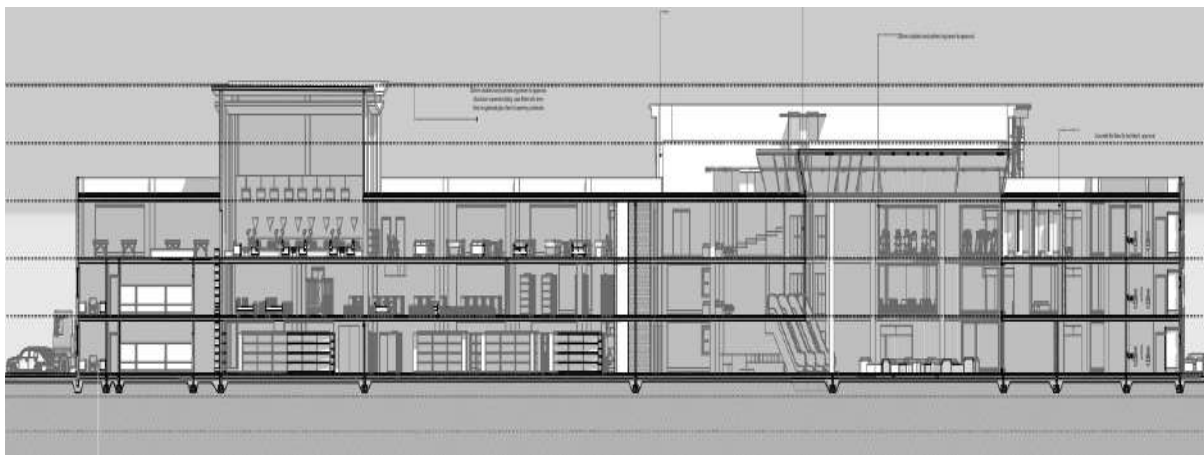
Section highlighting different sections of the proposed mall. Source: Author, 2024.
